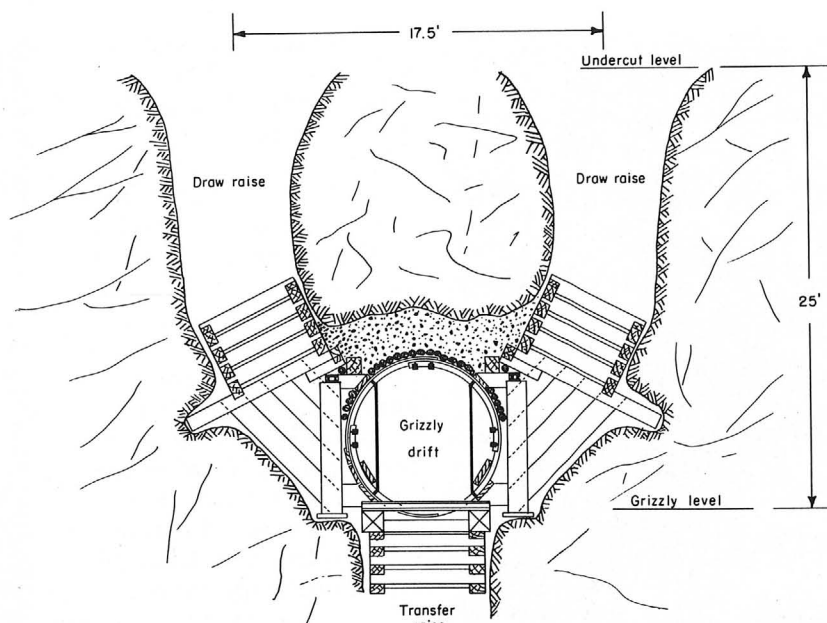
Steel-Supported Grizzly-Drift and Timber-Supported Draw-Raise Entrances.
